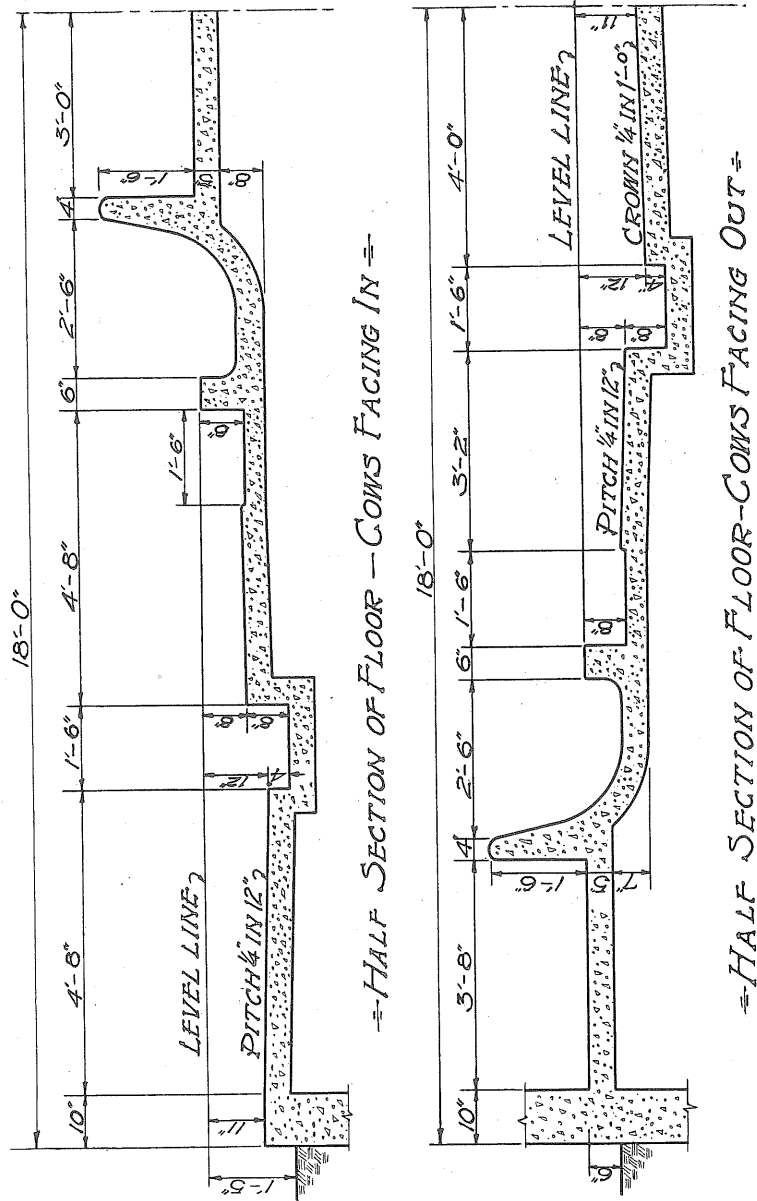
THE COW STALL FLOOR SHOULD BE CAREFULLY PLANNED
